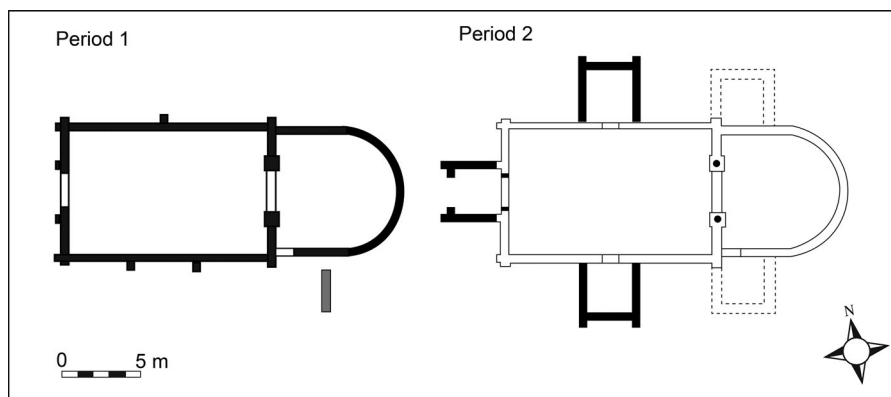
Revised phase plans of St Pancras Periods 1 and 2. On both plans, black indicates newly constructed walls and columns. Period 1a is indicated in grey on the Period 1 plan. Walls indicated in white on the Period 2 plan are those retained from Period 1. Broken lines indicate possible Period 2 walls, where the existence of these is a matter of interpretation rather than unambiguous evidence.
